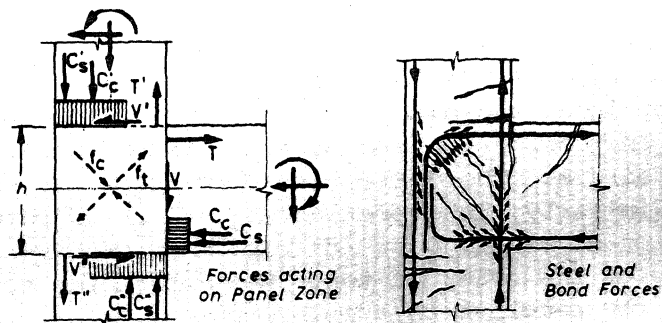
Stress resultants, crack pattern and bond forces at reinforced concrete exterior beam-column joint
